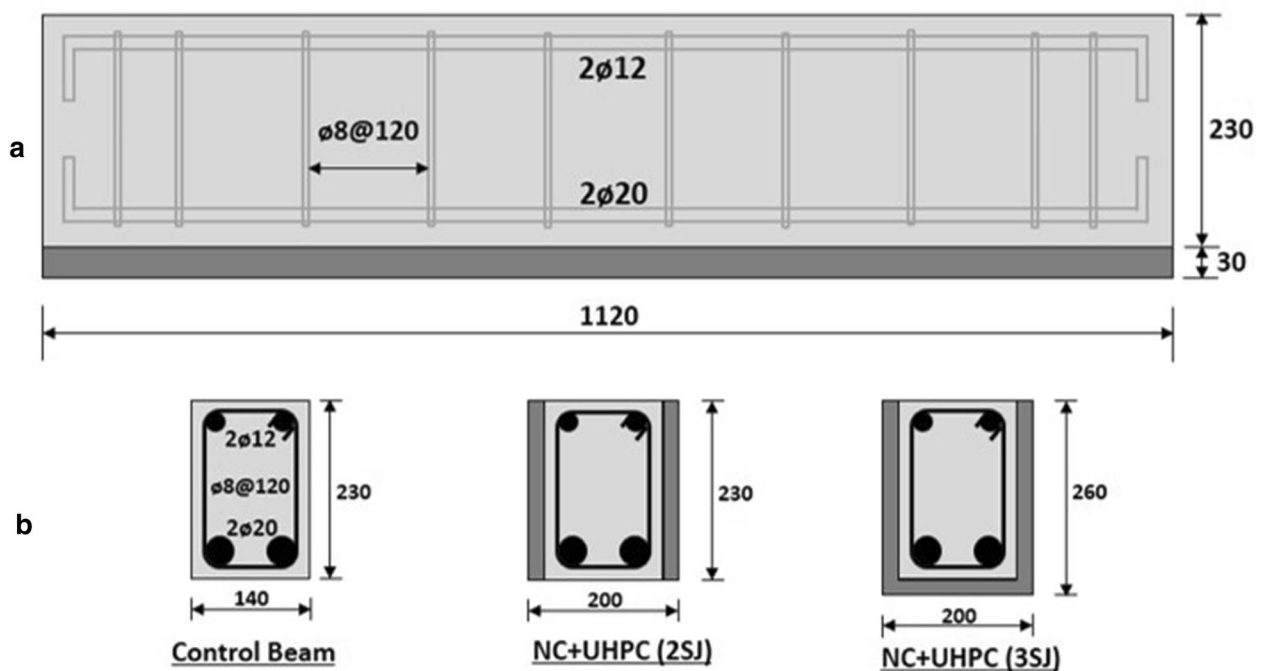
a RC beam details, b strengthening configurations (all dimensions in mm).
